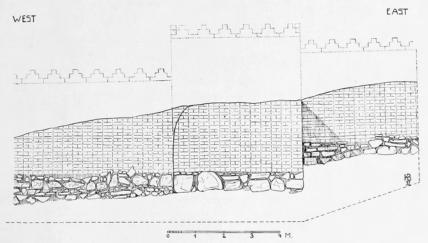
Reconstruction of Tower in D 14. Scale, 1:100
